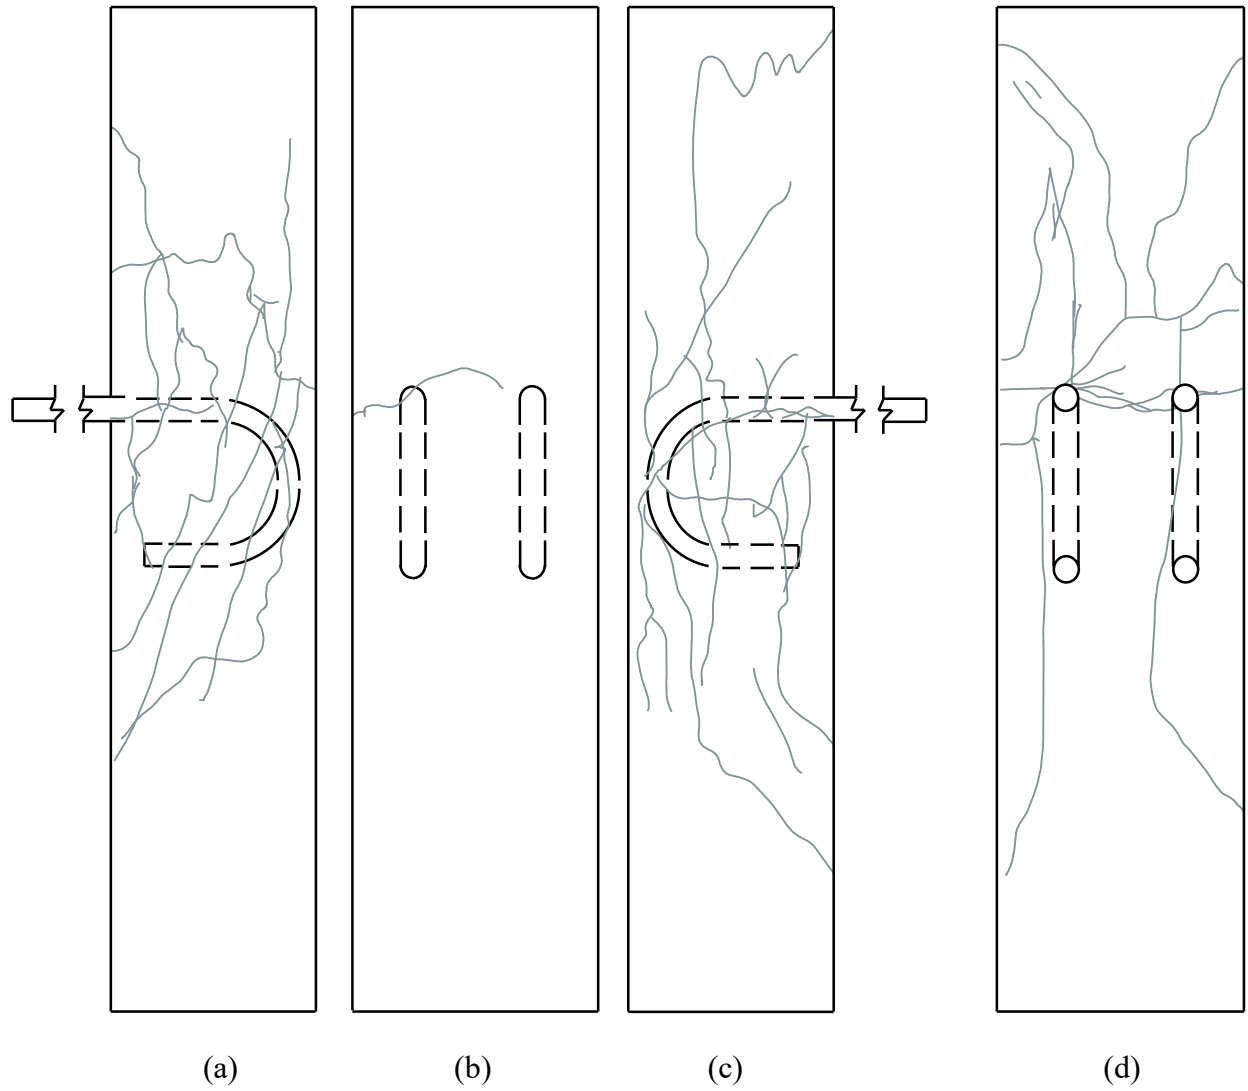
Crack pattern at maximum normalized tensile load for beam-column joint specimen P6-180: (a) west side face, (b) back face, (c) east side face, and (d) front face
